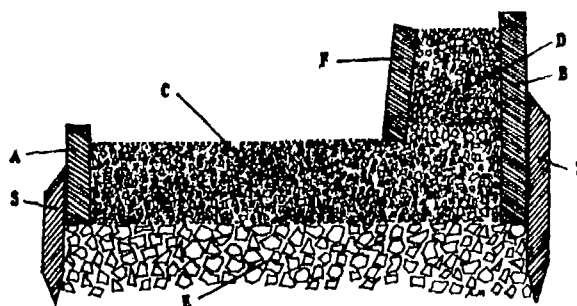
CONCRETE CURB AND GUTTER SHOWING DRAINAGE FOUNDATION AND CONCRETE BASE (TOP COAT NOT SHOWN)
